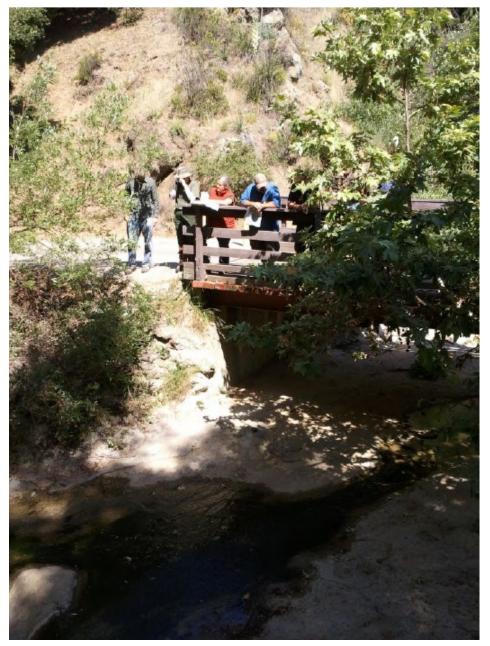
CC2, Malibu Meadows Road Crossing, Upstream End
